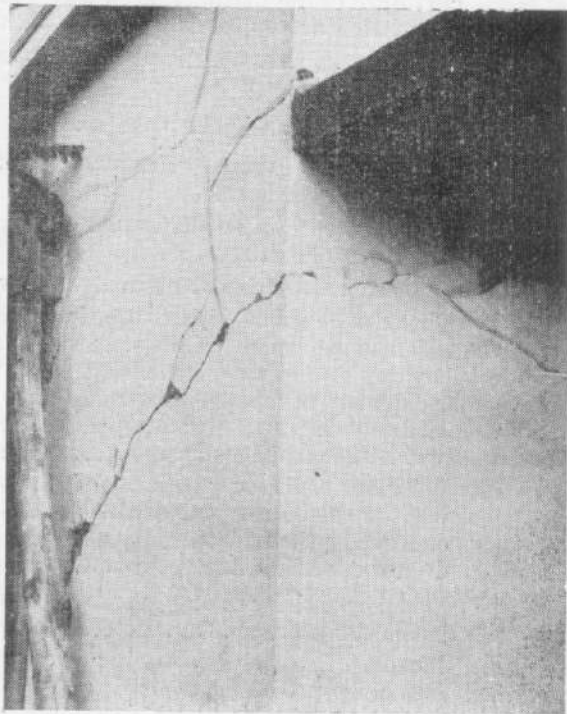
Development of cracks in brick masonry walls of Gate Clerk Room at Henry's Shaft Gate, which suffered extensive damage. The photograph shows northwest corner of the room from outside.
